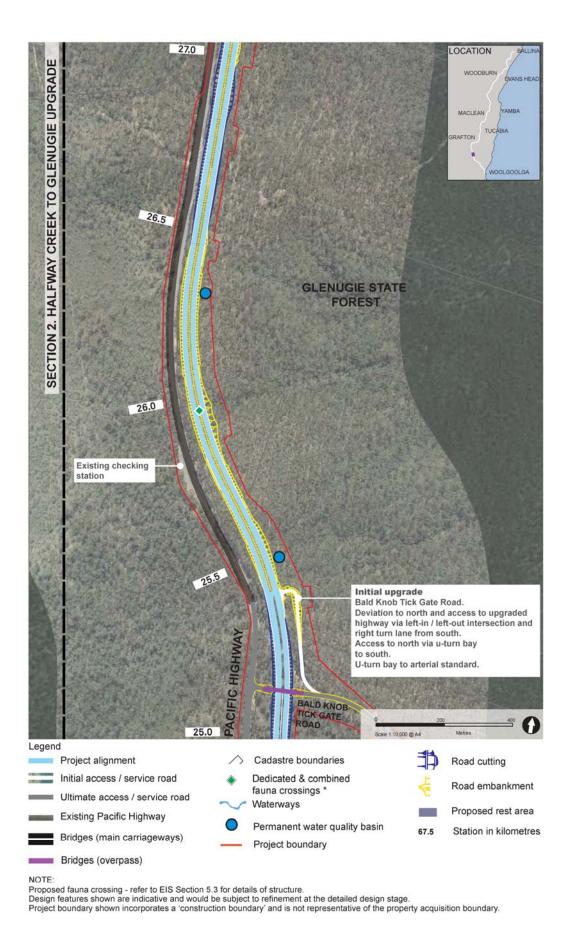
The project - Section 2 (Station 25.0 to 27.0)
